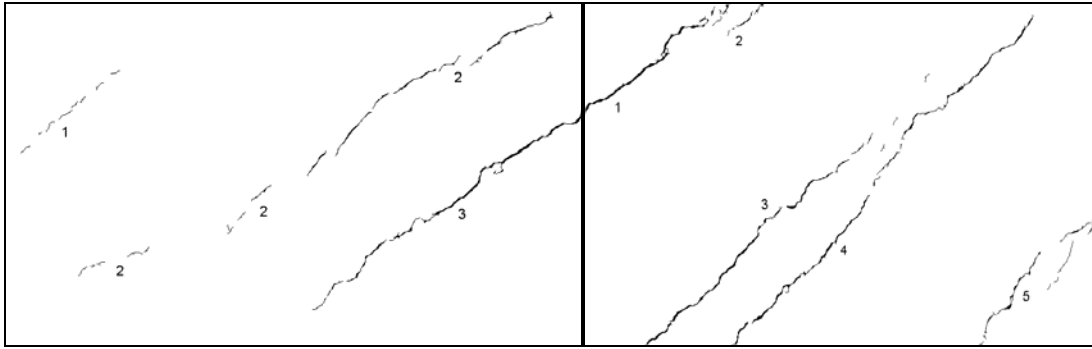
Detail of Second End Region Stirrup Failure in the WNEP Beam
